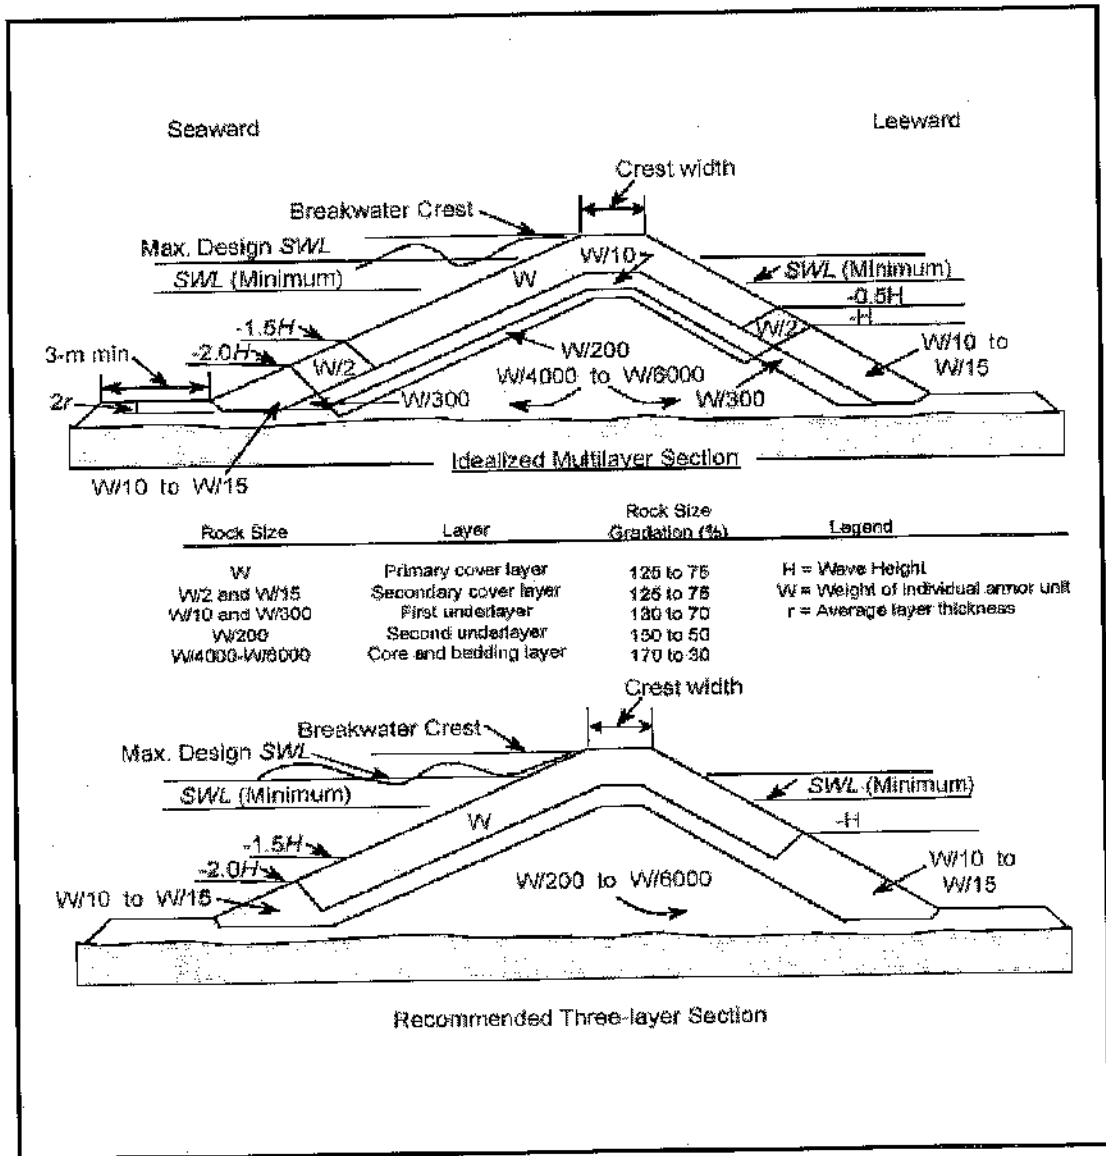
Typical cross sections of non-overtopping rubble mound breakwater
